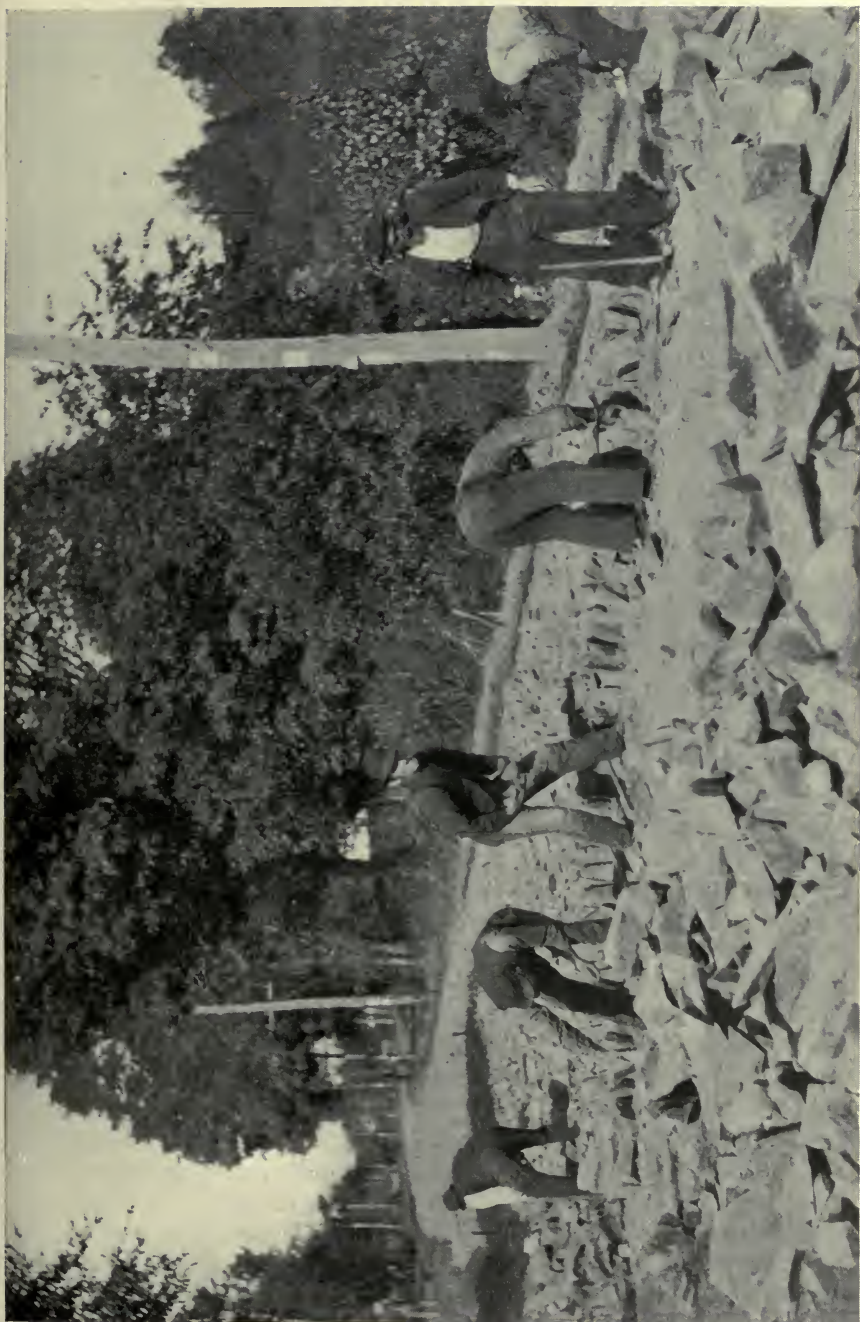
PLATE III.—STATE HIGHWAY, WESTFIELD, MASS. Laying Telford foundation.
